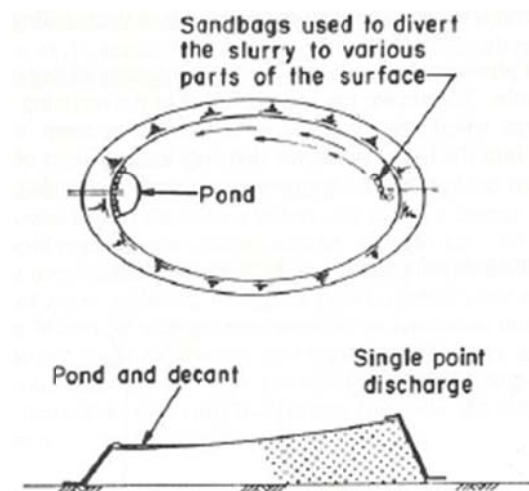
Plan and section through typical single deposition point tailings dam (Cooper, 1988)
